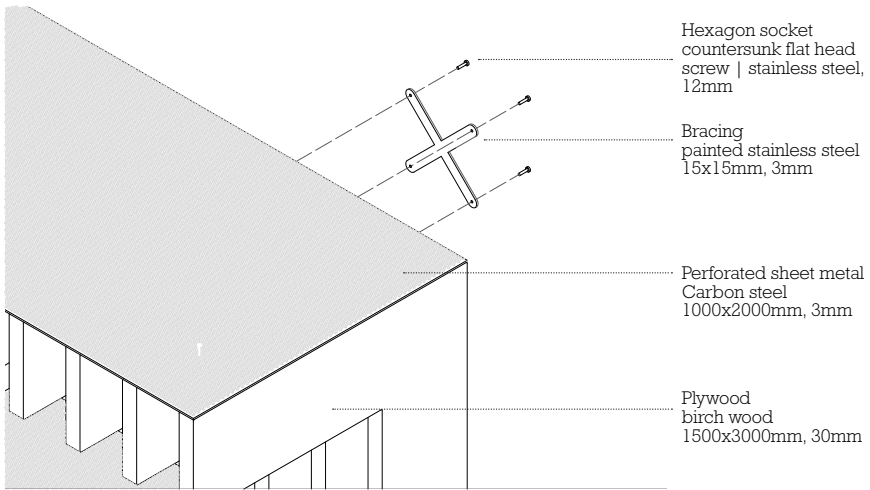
Construction detail - Joints of the main display element | Axonometric exploded view.
